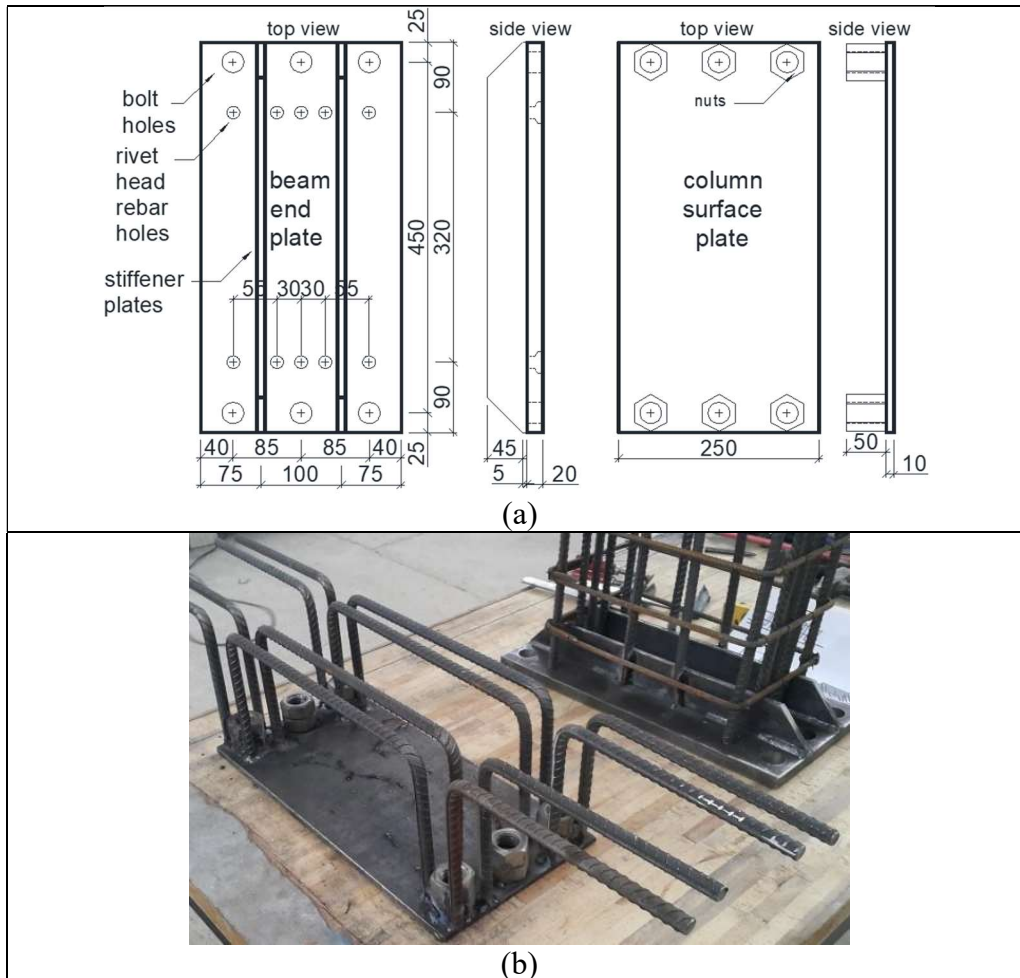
Details of connection plates of CB1-Pre-1 specimen; (a) Geometry of beam end-plate and column surface plate; (b) General views of the beam end-plate and column surface plate
